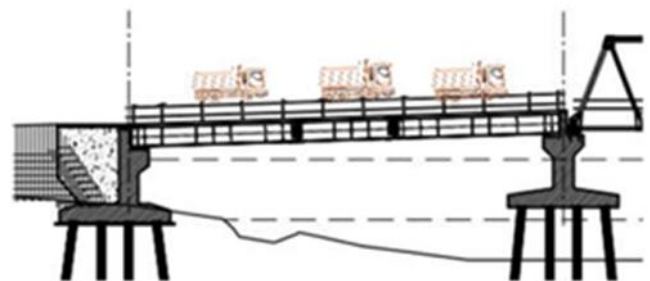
Illustration of a load of 3 trucks @ 10.5 tons on the girder bridge.
